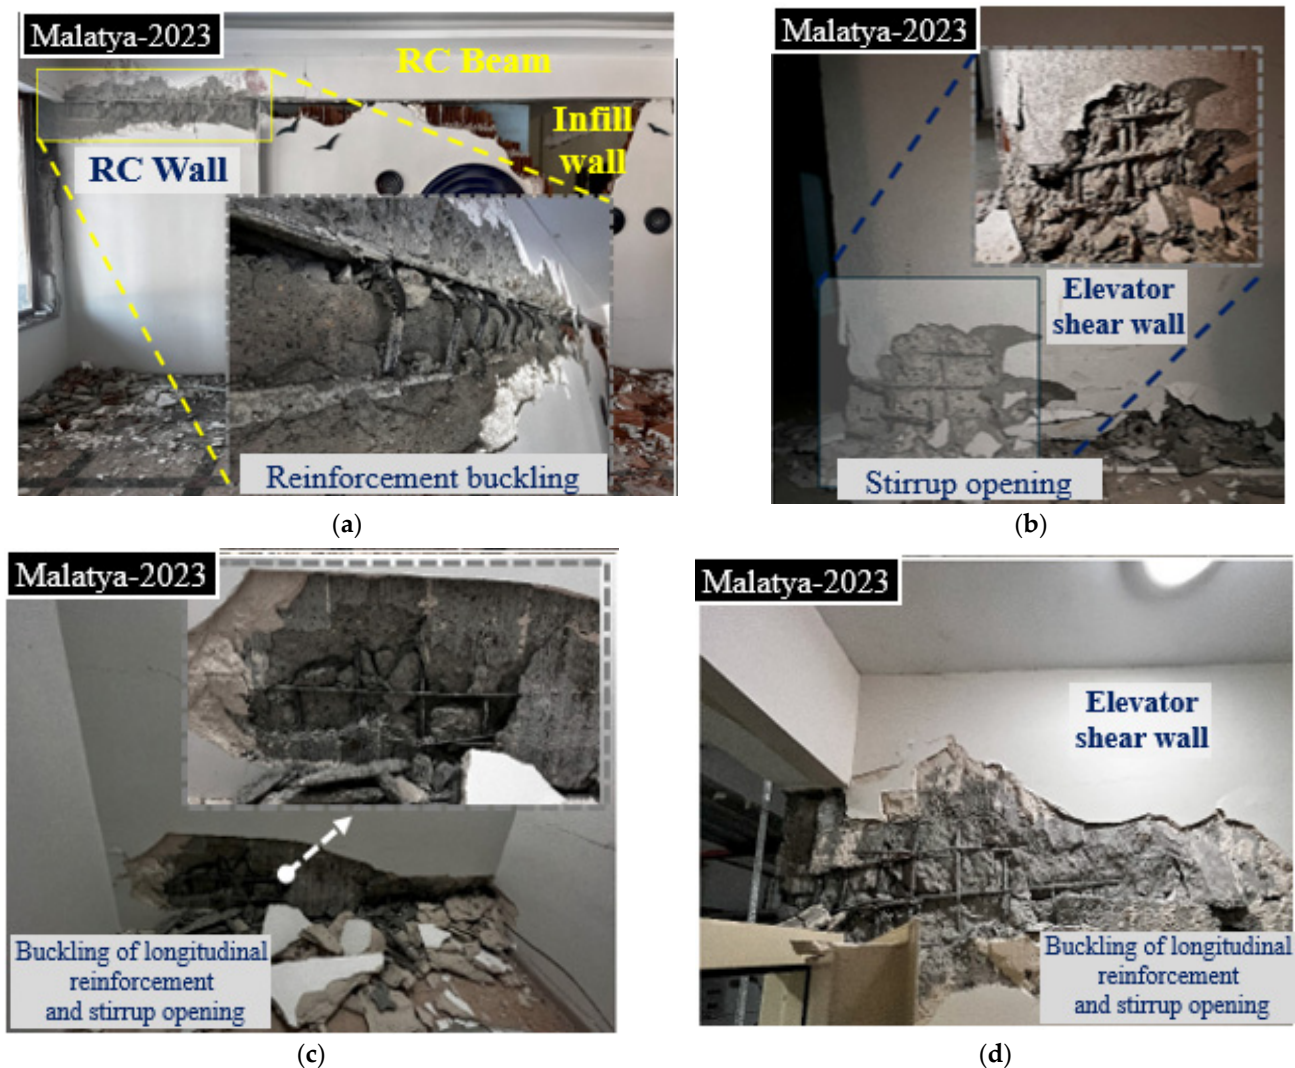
Examples of damages observed in reinforced concrete shear walls in Malatya Province following the 2023 earthquake; (a) reinforcement buckling; (b) stirrup opening; (c) concrete crushing; (d) elevator-core wall damage.
